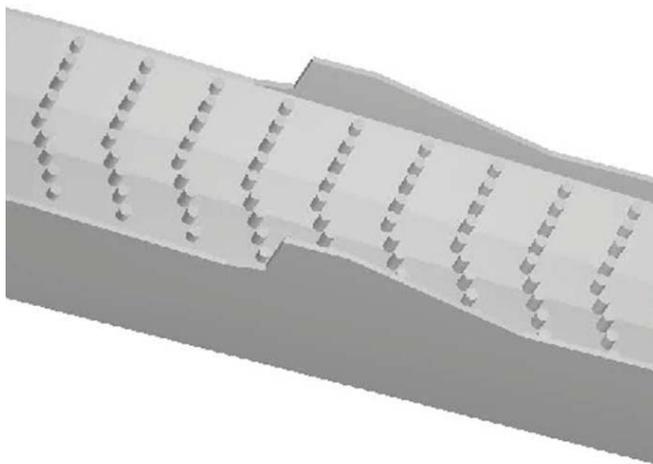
Isometric view showing a section of the trapezoidal fishway channel with cylindrical pile baffles modeled in Flow3D.
